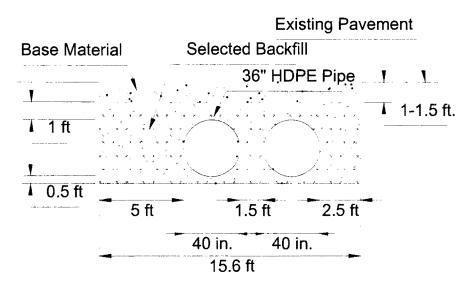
Cross-Section of Installation A2 in Atlanta District.
